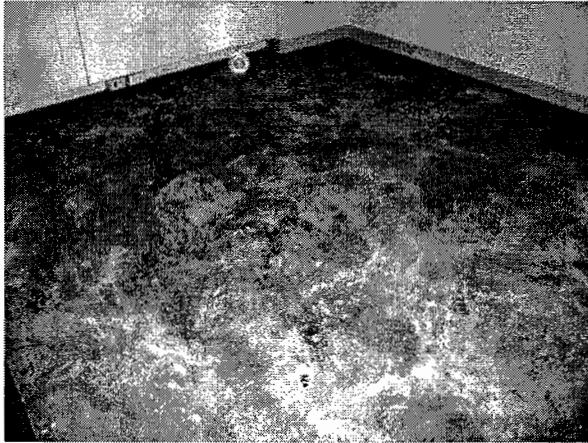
Floor 27 carpet water damage and visible mold
